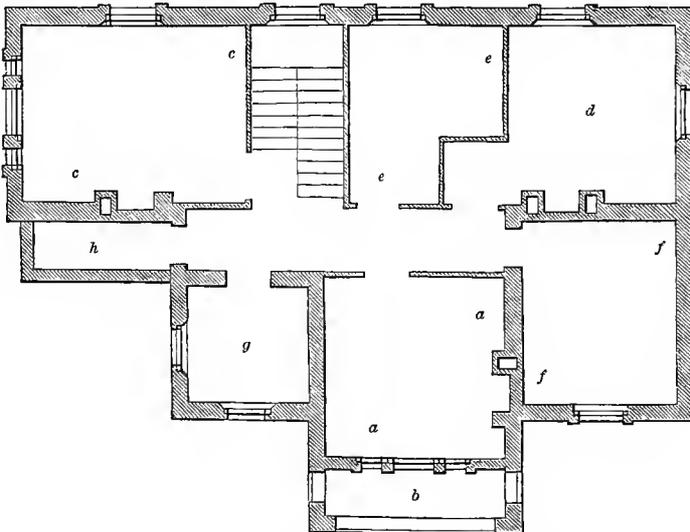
Chamber-floor plan of farmhouse in Italian style—scale in fig. 714.
